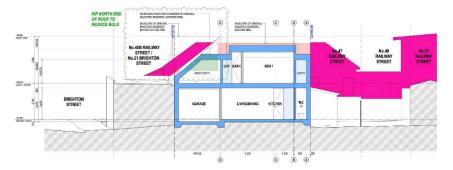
Cross section through proposed new development showing similar roof-forms of proposed new roof and existing dwelling (19 Brighton Street) on opposite side of laneway (shaded pink behind). (Ref: DA page 11/32)
